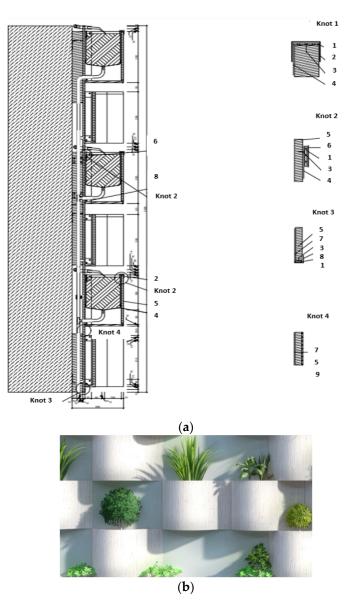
Vertical greening systems, designed and patented by the authors: (a) Section view of innovative modular green wall systems; 1—sealant, 2—profile, 3—constructive bracket, 4—geotextile bag, 5—wooden plate, 6—plastic strip, 7—vapor barrier, 8—plastic corner, 9—water-based paint; (b) 3D view.
